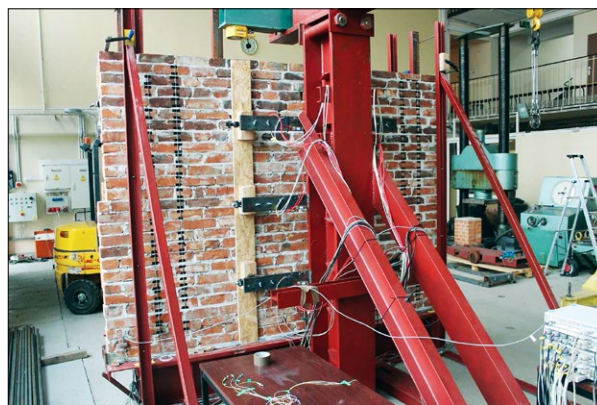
Test of a wall straightening treatment using a test wall carried out in Laboratory L-1 of the Faculty of Civil Engineering of the Cracow University of Technology, 2015; photo by S. Kańka.
